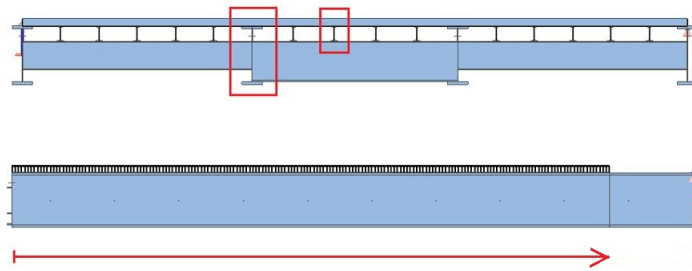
Considered deck-to-girder connections, front view (top). Longitudinal path along girders, side view (bottom)
